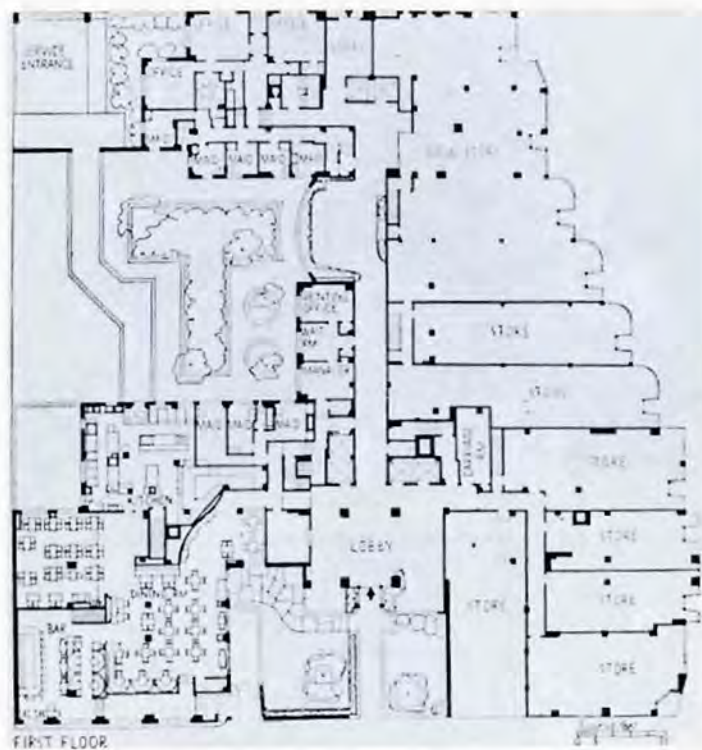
240 Central Park South. Mayer & Whittlesey. 1941. Plan of ground floor.
